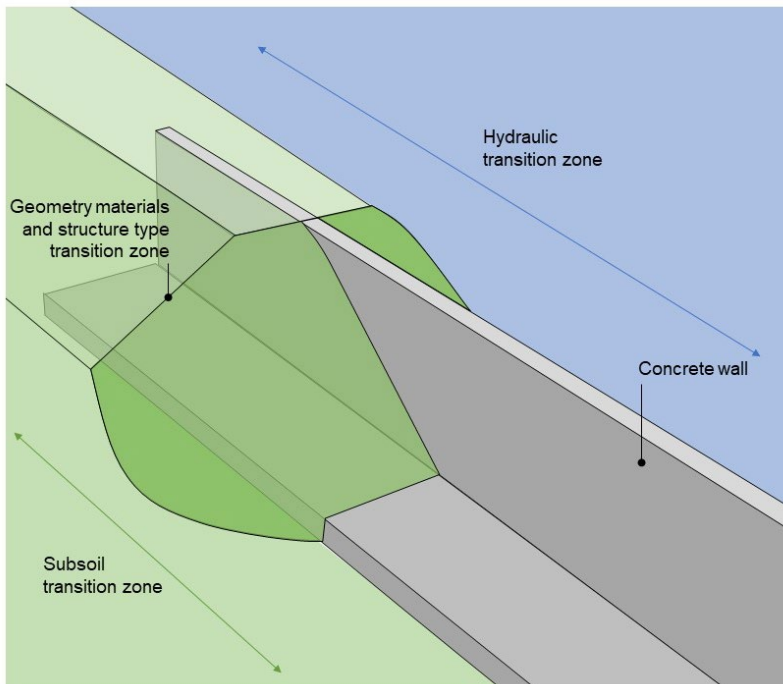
Diagram of a transition zone between a flood wall and earth embankment
